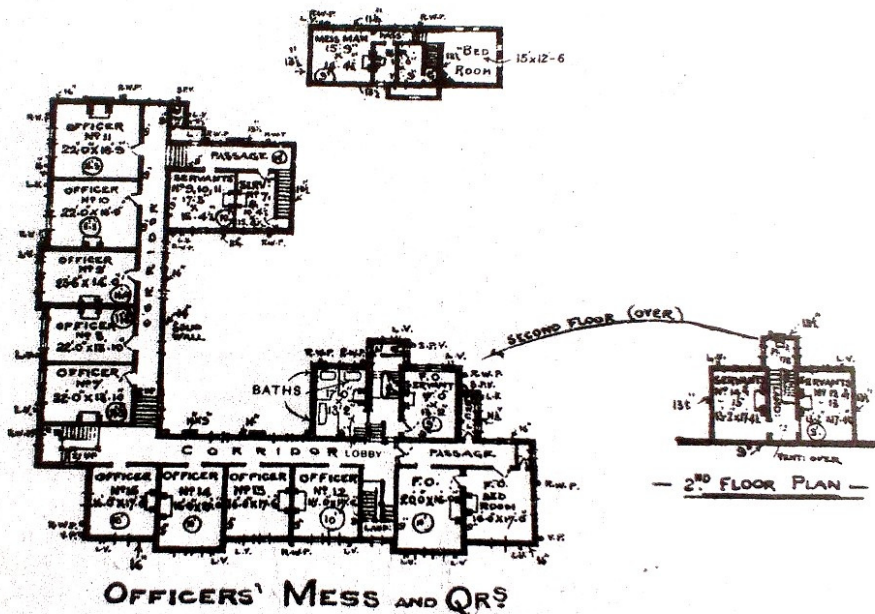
Extract from 1911 plan showing the original function and layout of the first and second floors of MEE 17 (EHA 95/1580).
